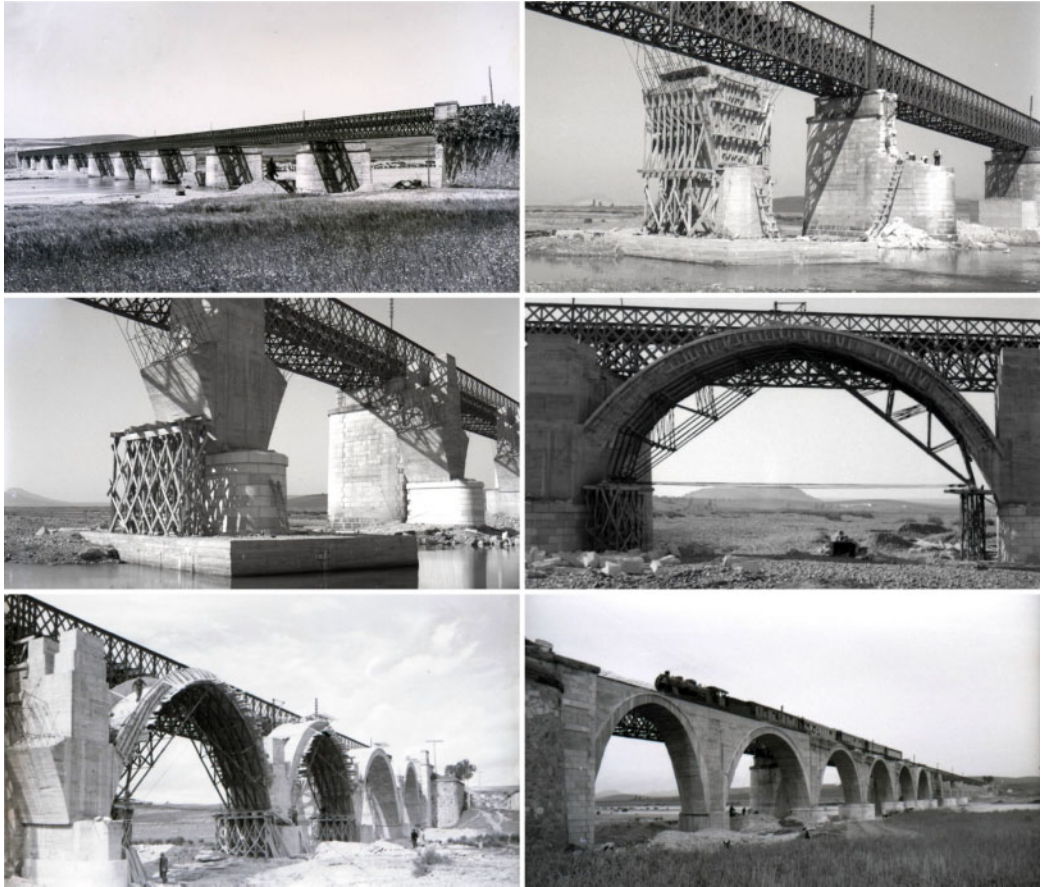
Zarza Bridge. Top: old bridge; execution of the new piers while former piers are being dismantled. Middle: piers already executed; centering. Bottom: groups of centerings; train on the old bridge while the new bridge is under construction. Photos by Vicente Garrido Moreno (AHF-MFM VG-IF- 2229-; VG-IF- 2244-; VG-IF- 2257-; VG-IF- 2256-; VG-IF- 2264-; VG-IF- 2288-). The collection consists of 68 photographs taken from 1954 to 28.03.1958.
